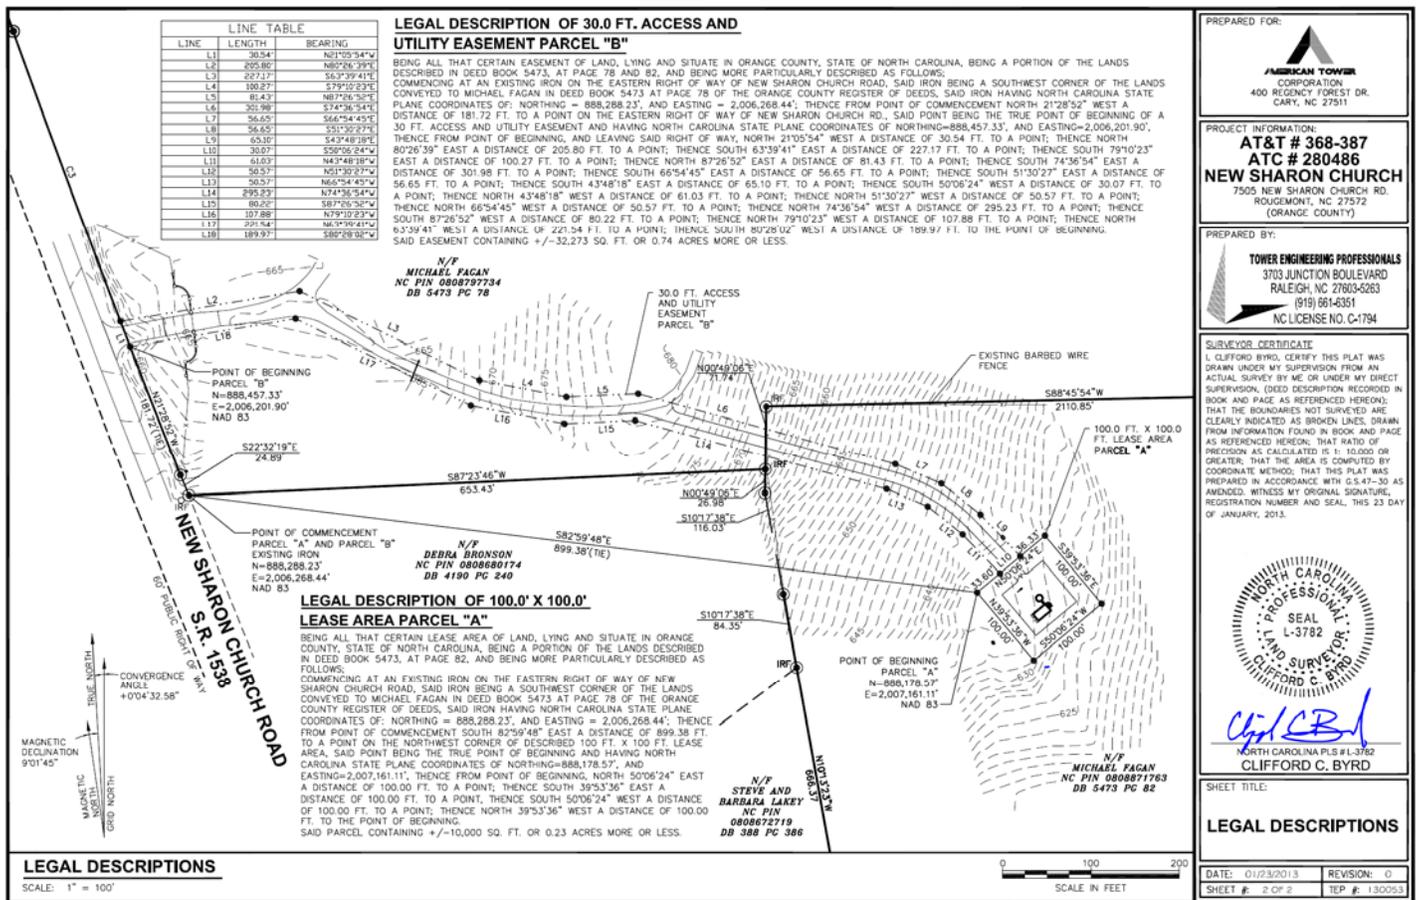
Site plan and legal description of New Sharon Church Rd. site
